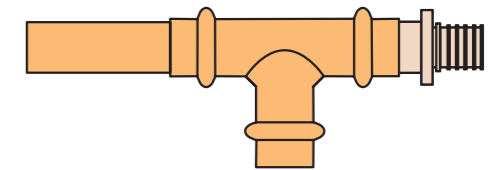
Soldering/Pressing adapter RAUTITAN RX+ with copper pressing system
